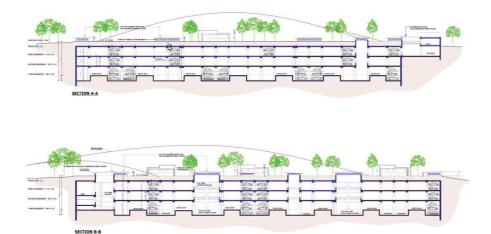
Cross sections of proposed parking © Department of Urban Planning, U.T. Chandigarh
